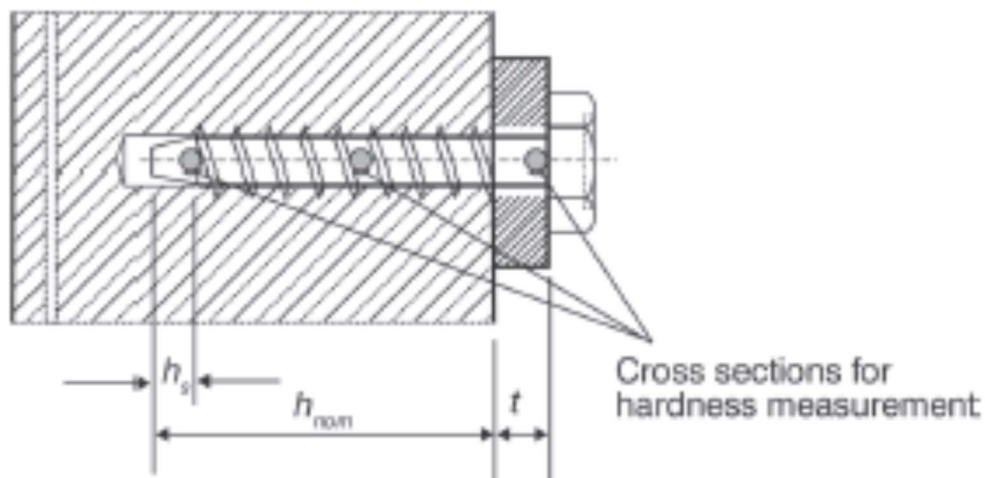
Screw anchor dim.-ACI CODE-355.2 (American Concrete Institute, 2019)
